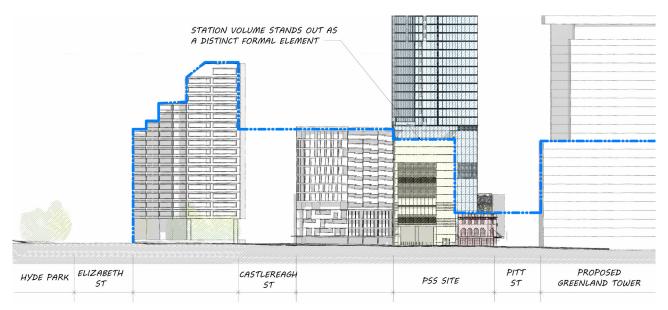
Indicative Street Wall Response - Bathurst Street Elevation
